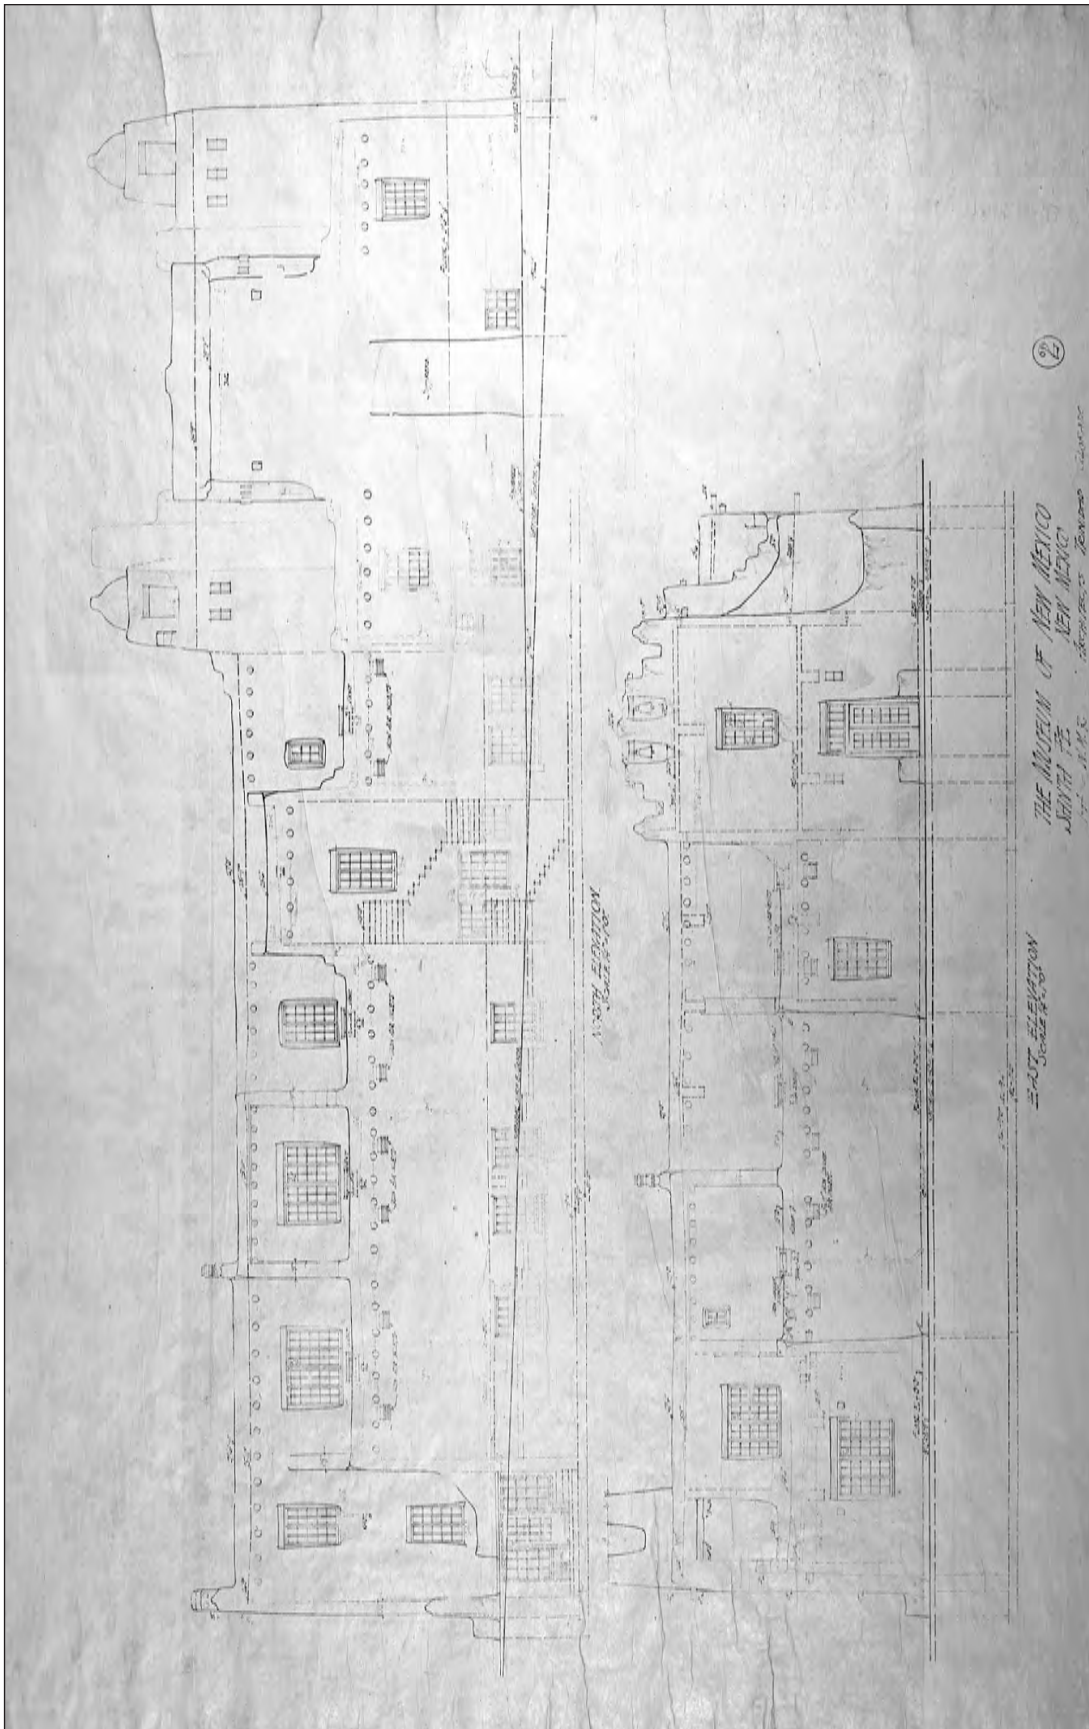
Architect's north and east elevations of the Museum of Art construction plans.
